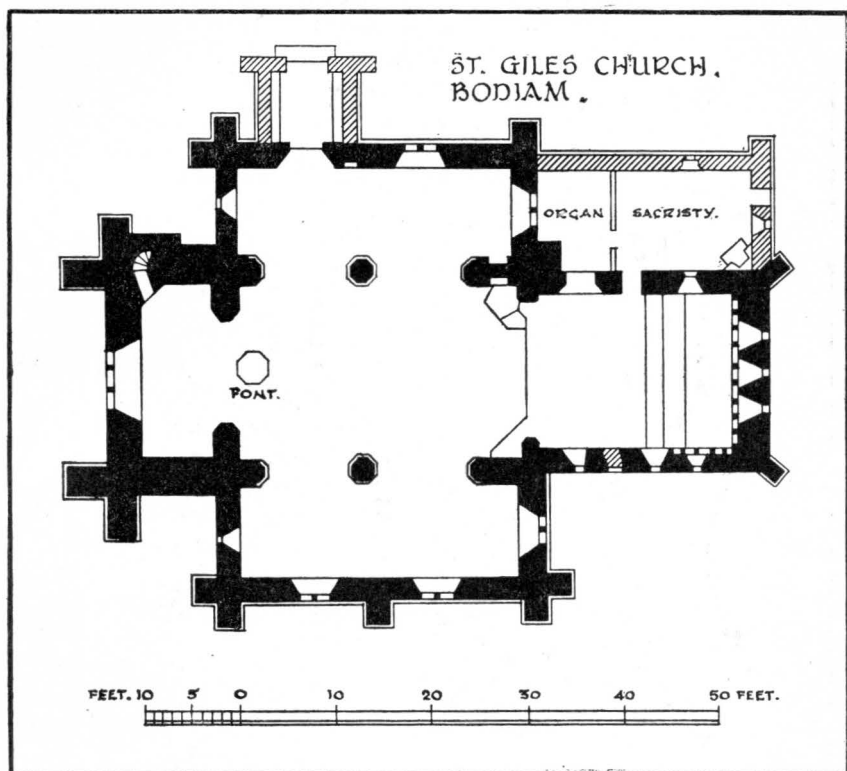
BODIAM CHURCH: GROUND PLAN.
